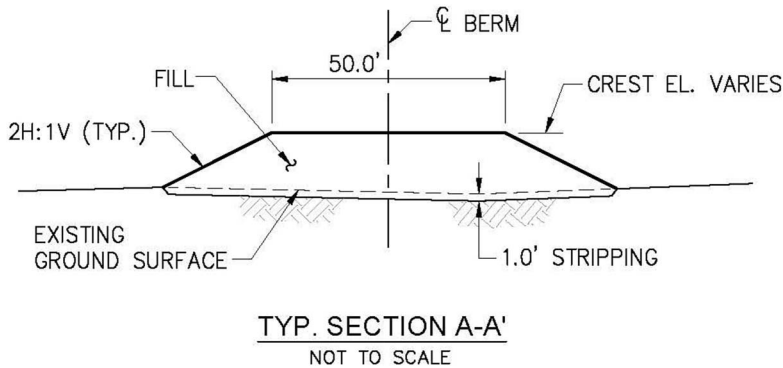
S-9. Typical Section A-A' of a Sloping Berm
